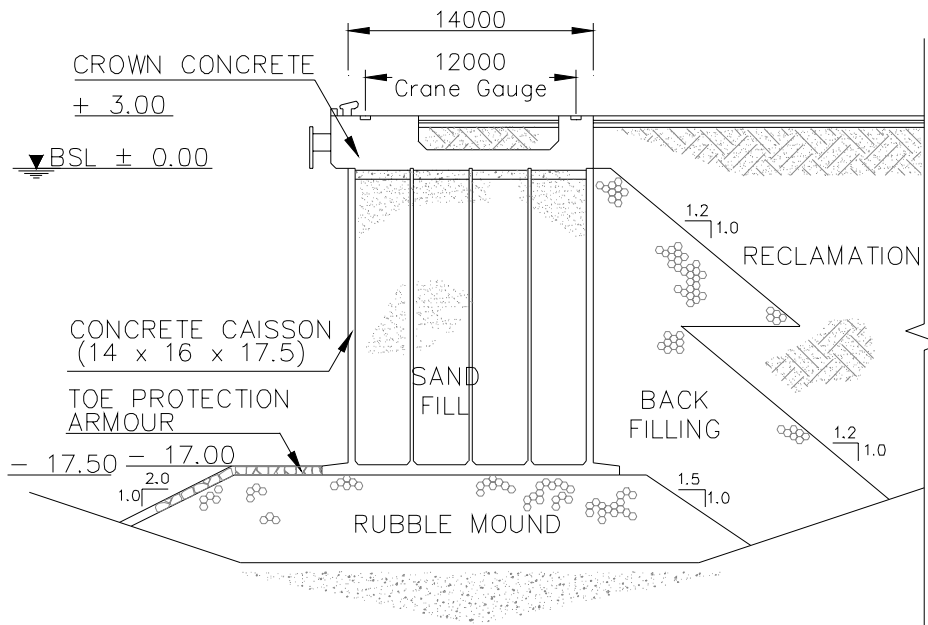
Cross-Section of Caisson-Type Structure (Berth No. 2)
